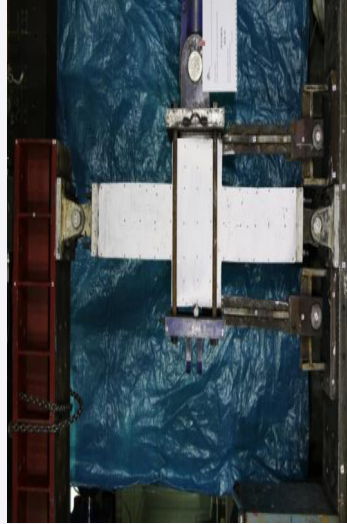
Rigid connection of the vertical braces to the beam and pine connection of hydraulic actuator
